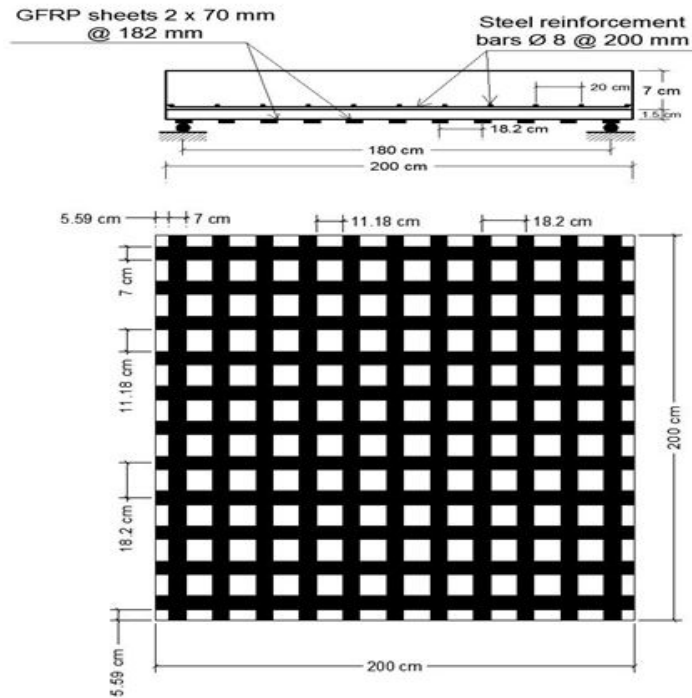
Adding lower concrete layer reinforced externally by bonded GFRP strips
